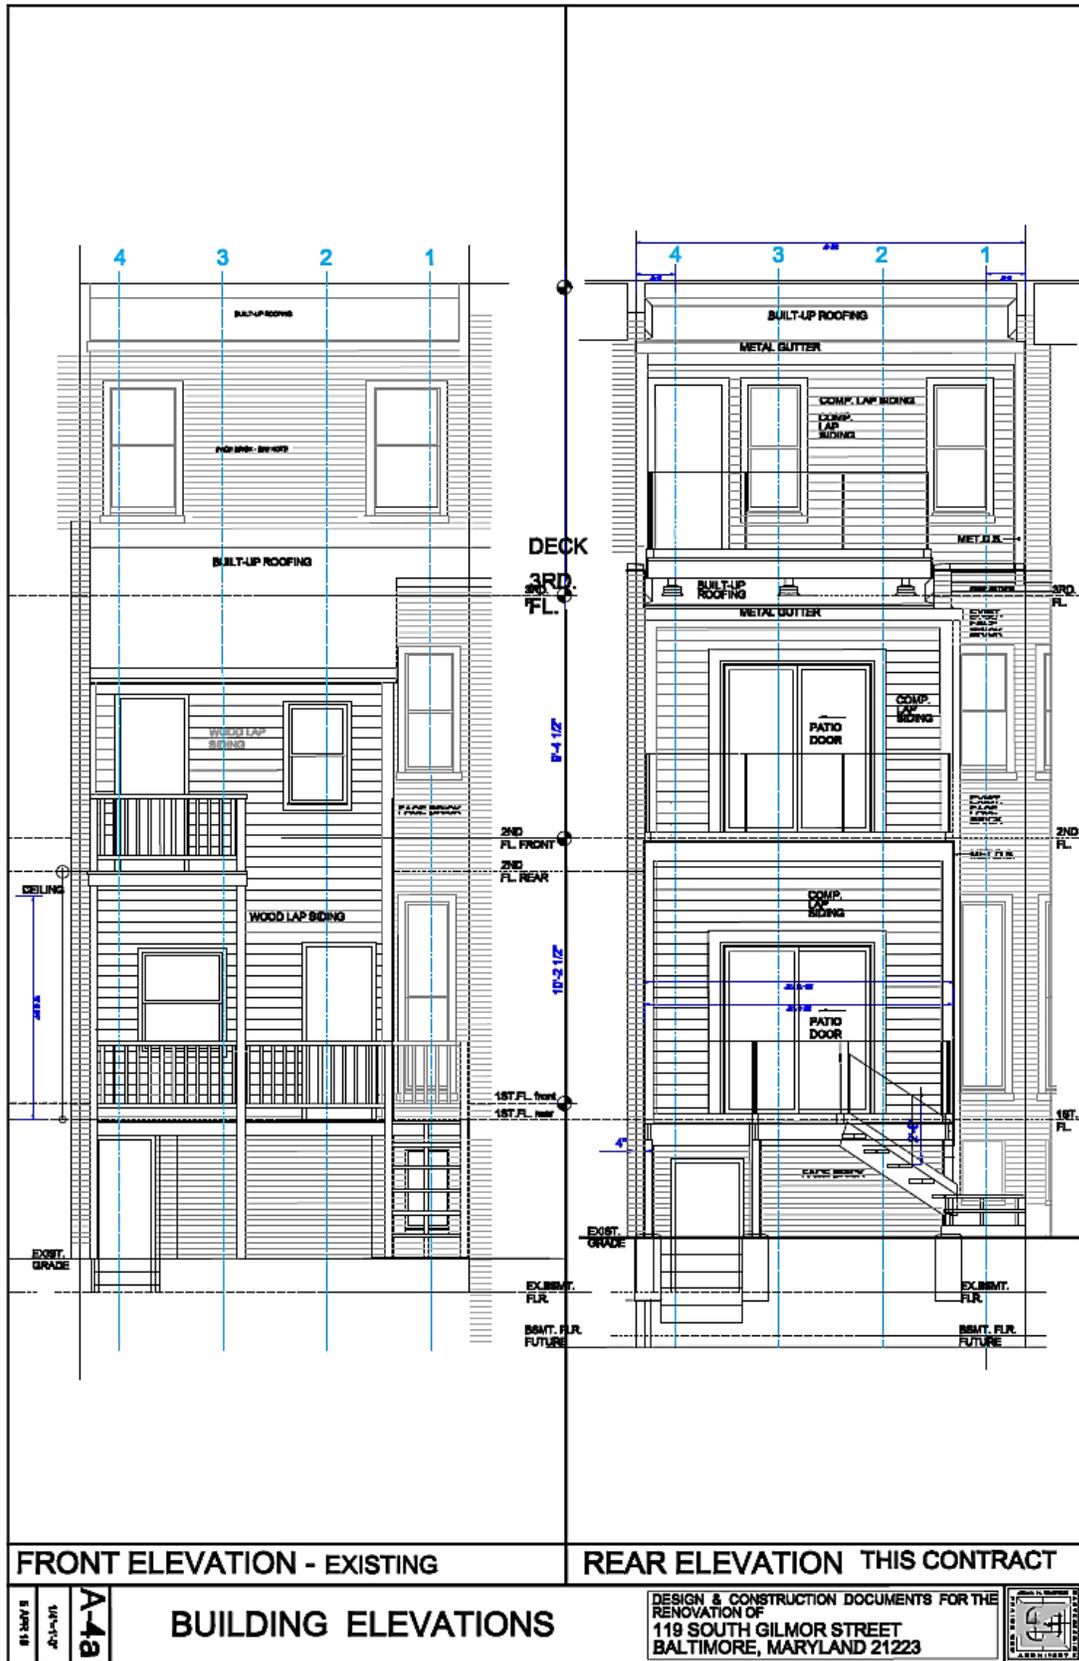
Previous and proposed rear elevation, 119 S. Gilmor Street, April 5, 2018
